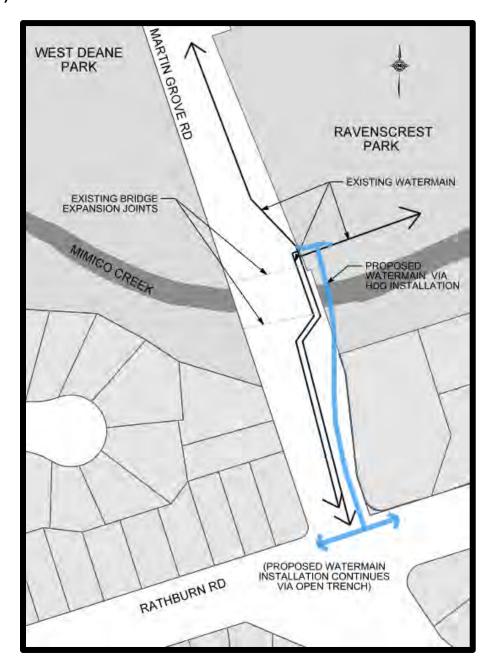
Alternative #4: Watermain aligned east side of Martin Grove Road / Bridge
